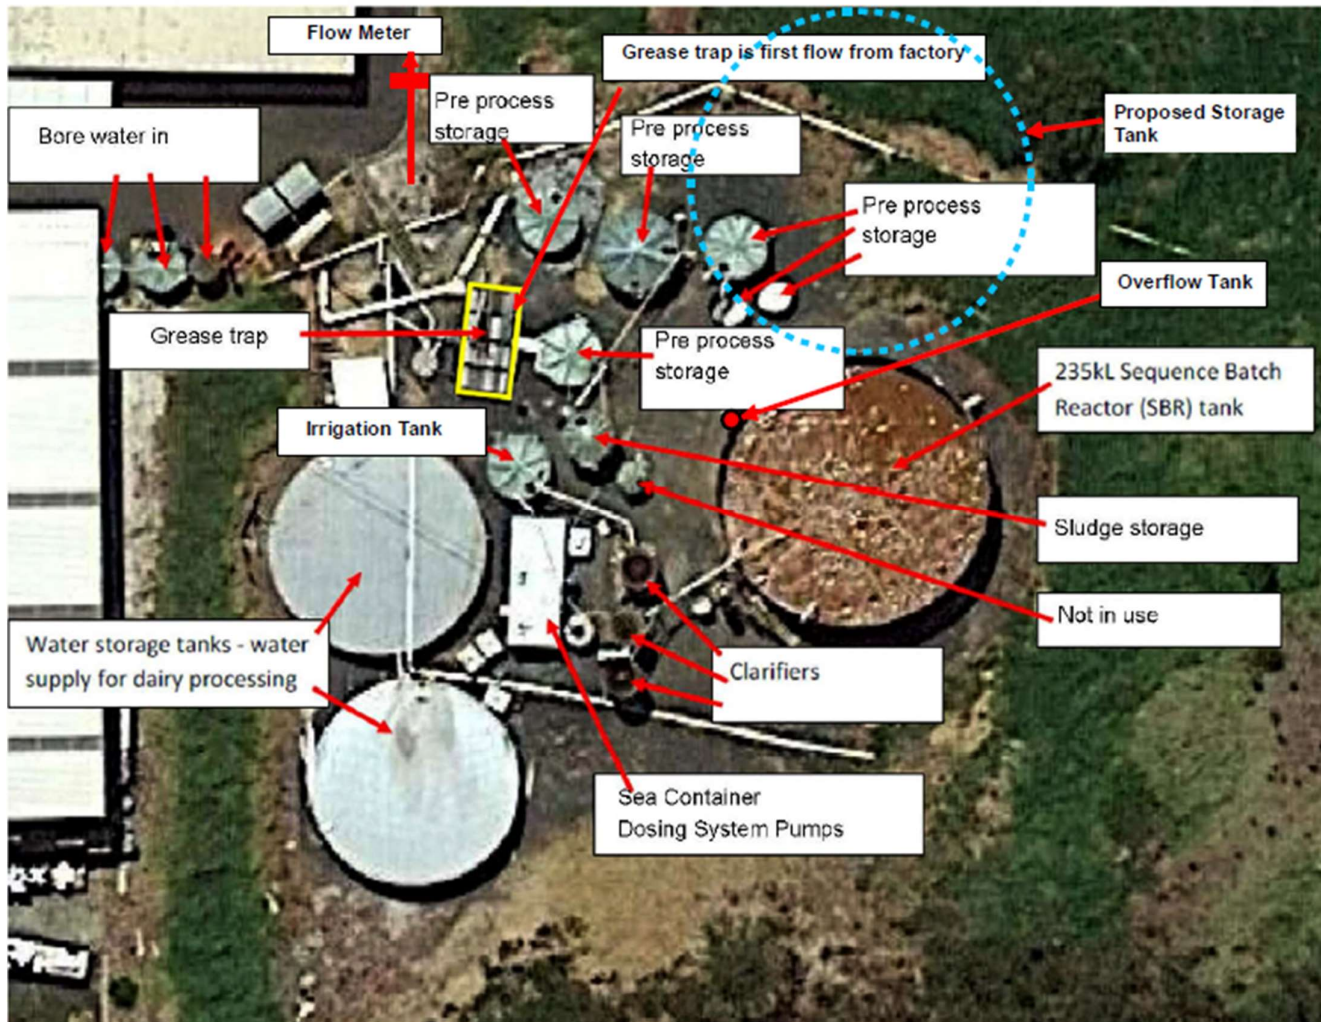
Wastewater Treatment System (WWTS) Layout Plan (from Application)
